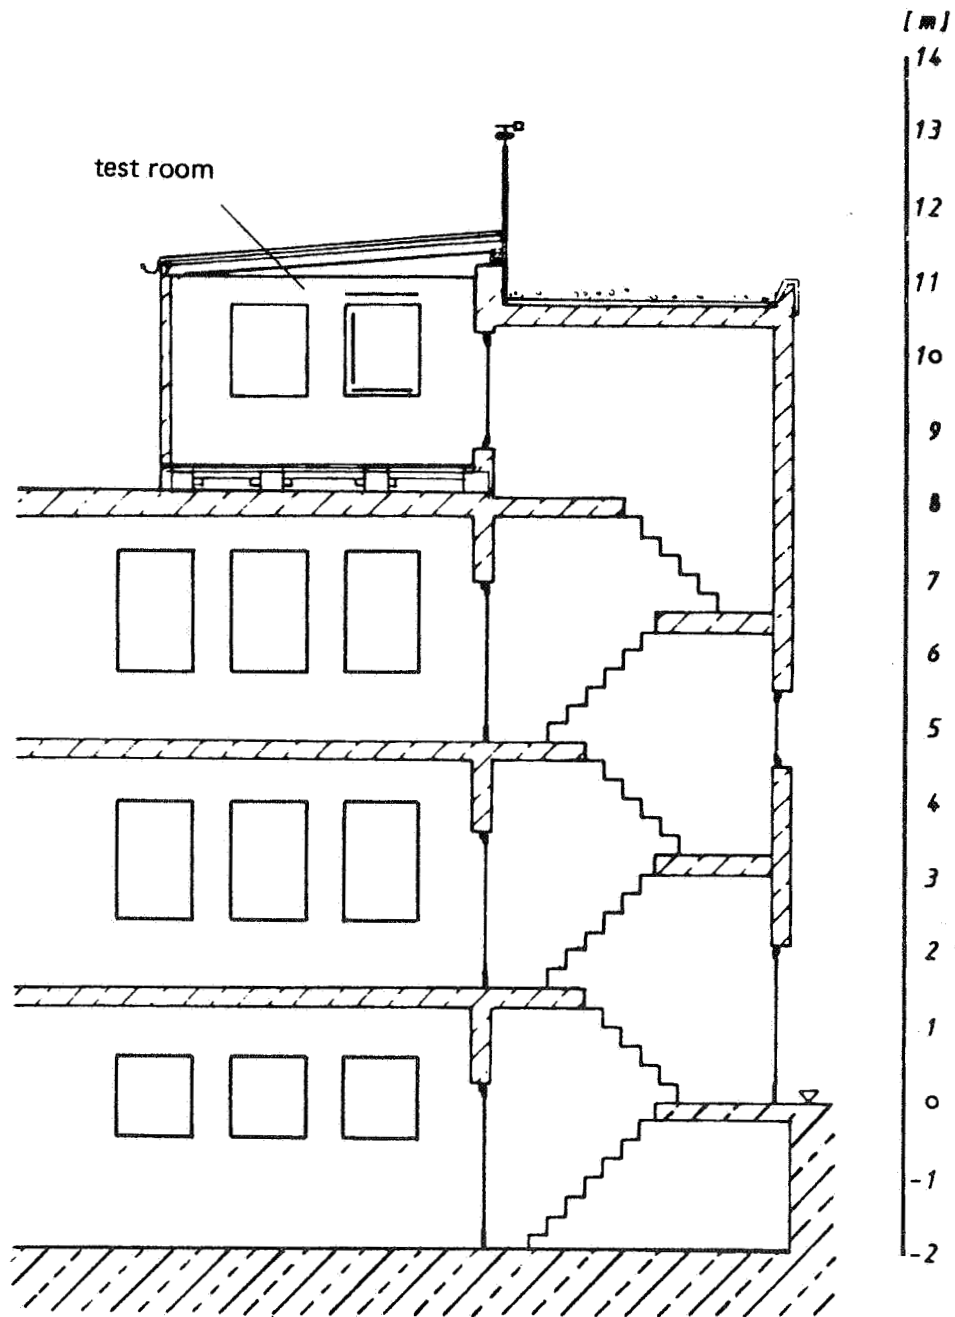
Sketch of institute building showing position of test room (view from east)
